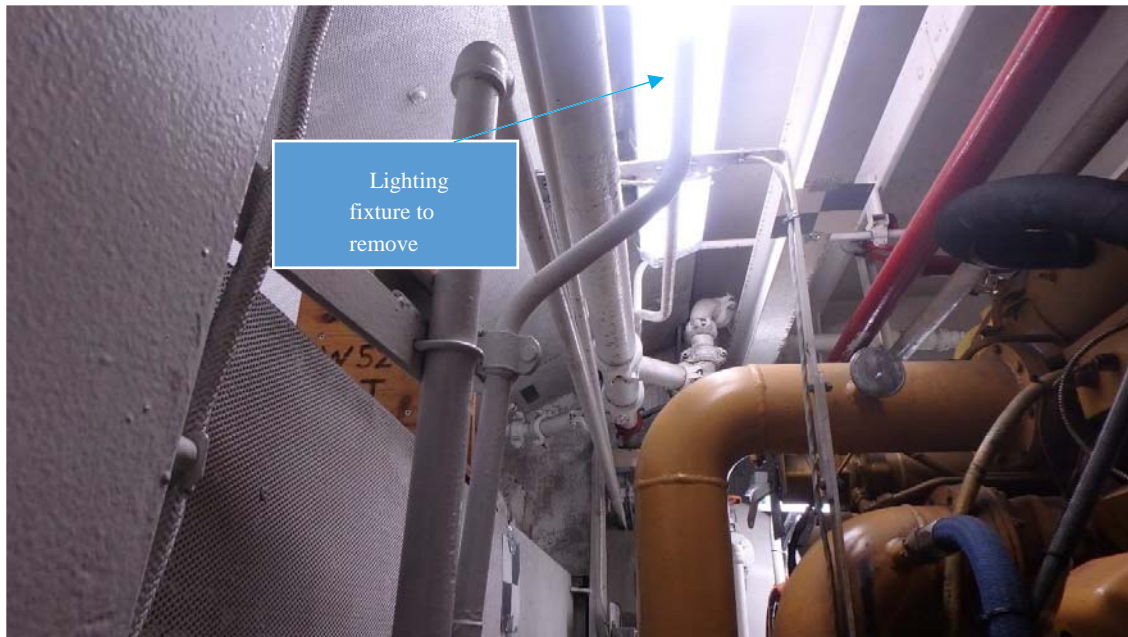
Lighting fixture to remove; in order to remove/install Caterpillar engines
